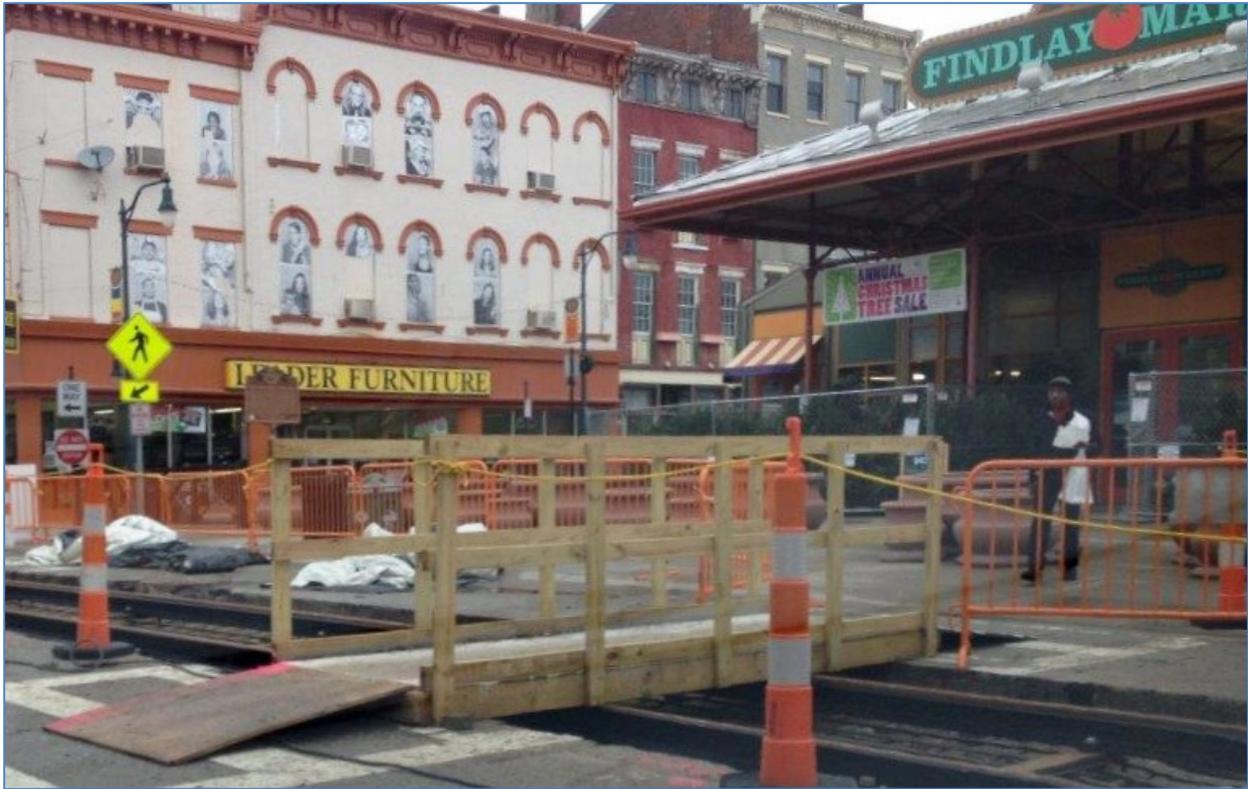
Access to Findlay Market prior to placing concrete track slab
